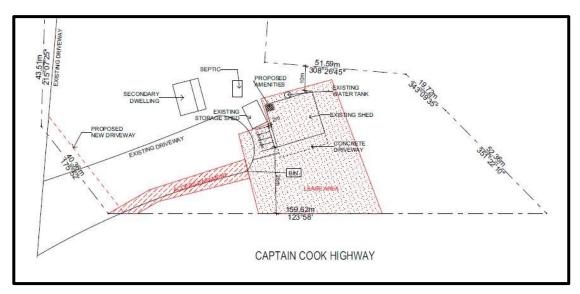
Site Plan showing Lease Area and Access Easement (Angel Construction).
